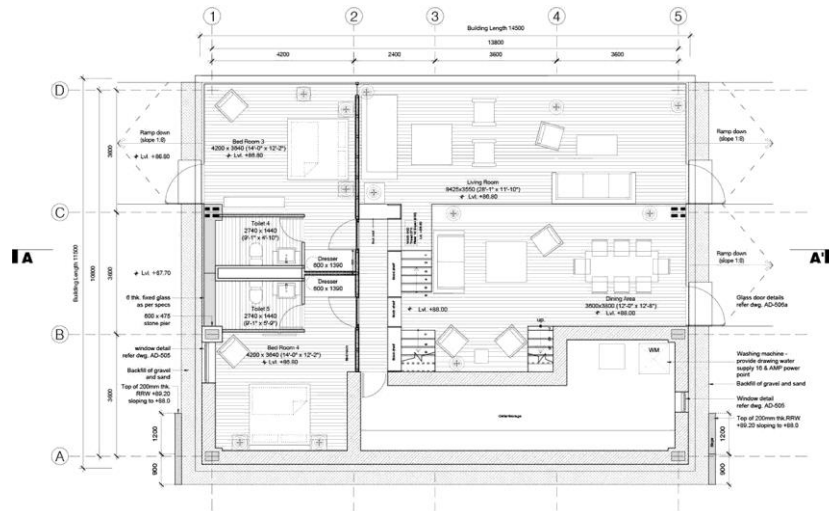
Lower ground floor plan (Source: <https://arqa.com/en/architecture/wood-house.html>)
